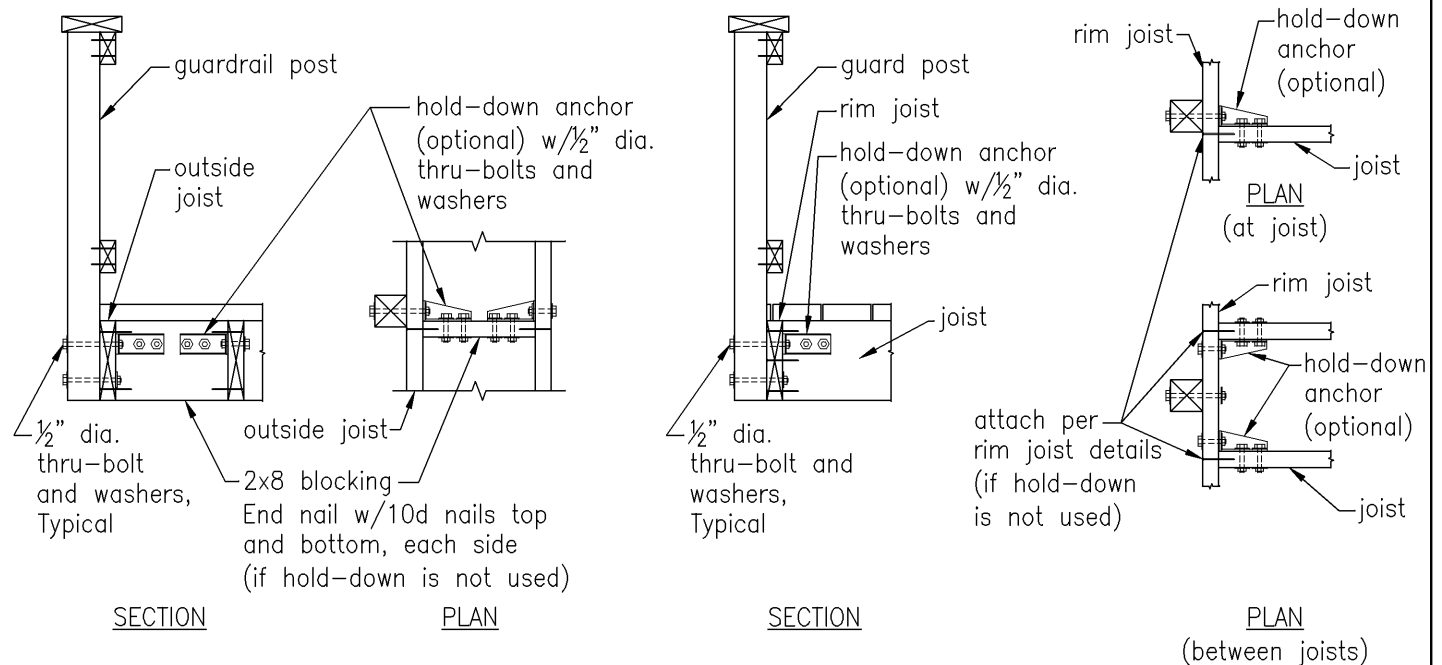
GUARDRAIL POST CONNECTION DETAIL
